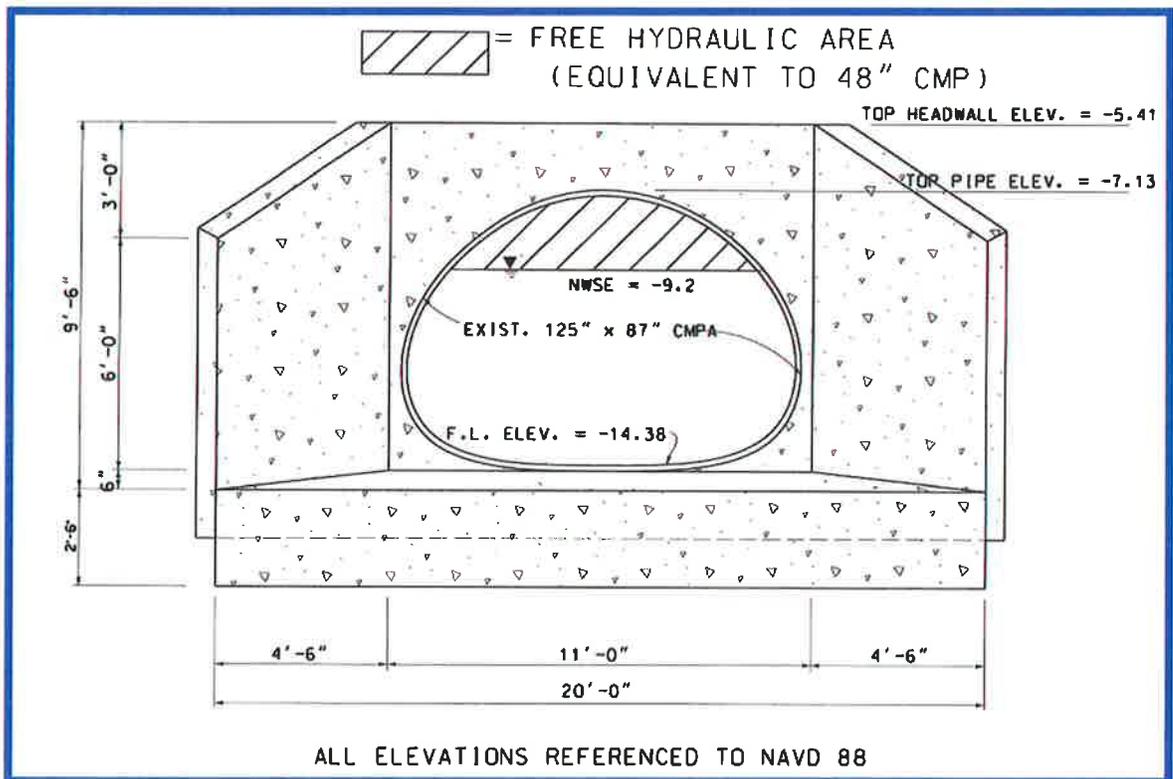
Culard Culvert outfall and headwall detail showing the limited free hydraulic area as a result of the constant high water level present in the Barriere Canal
